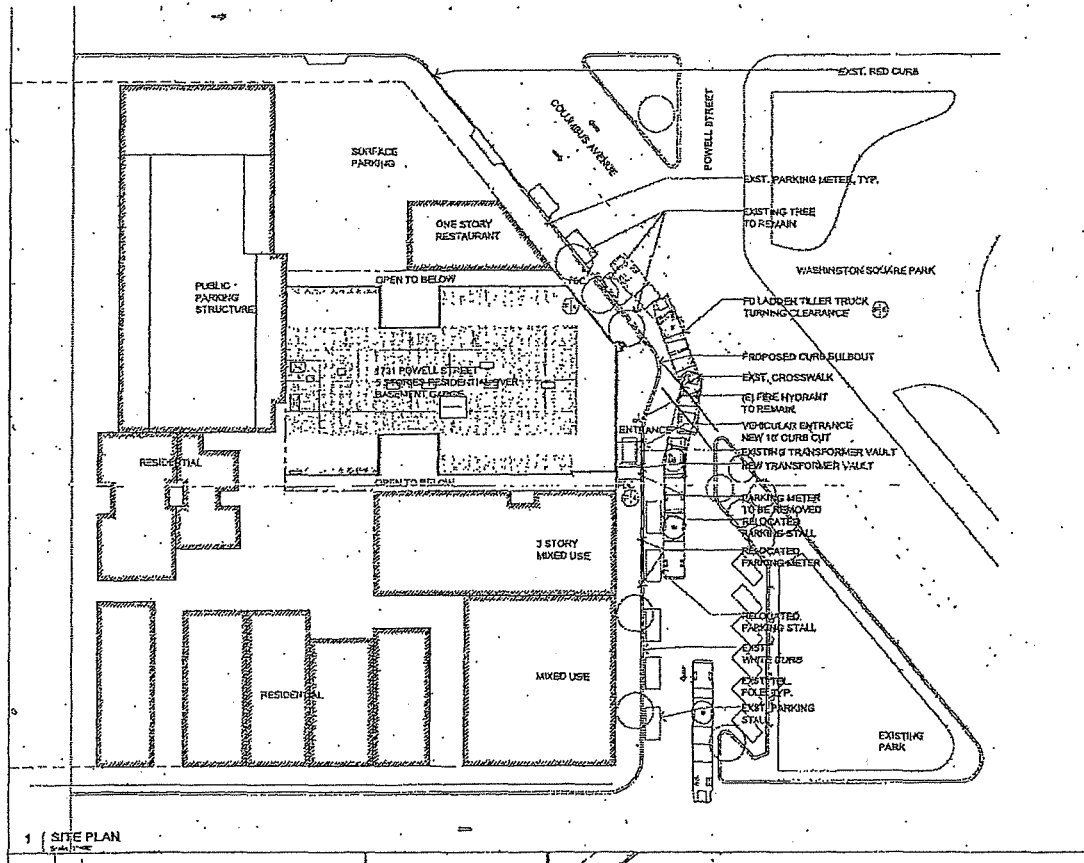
PROPOSED 1731 POWELL ST SITE PLAN
